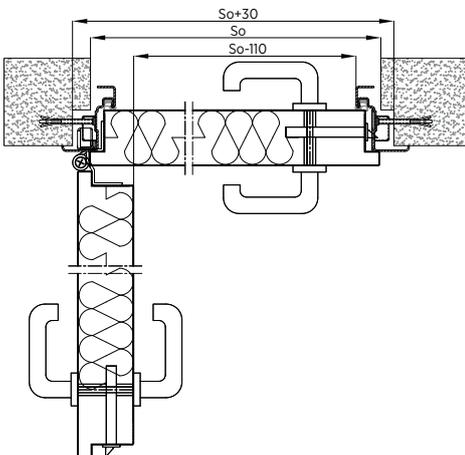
Installation of the ECO Tech single-leaf seamless door with a corner frame without a thermal break to a masonry wall - horizontal cross-section
